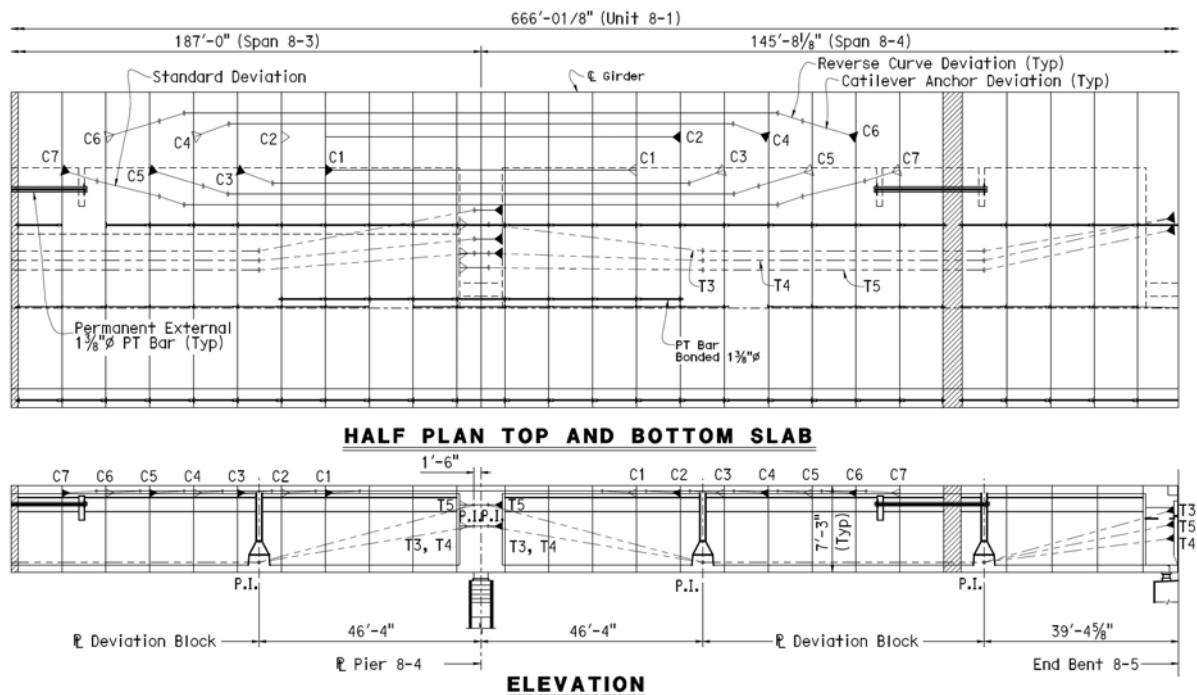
Tendon Layout for the Precast Segmental Cantilever Bridge Design Example
